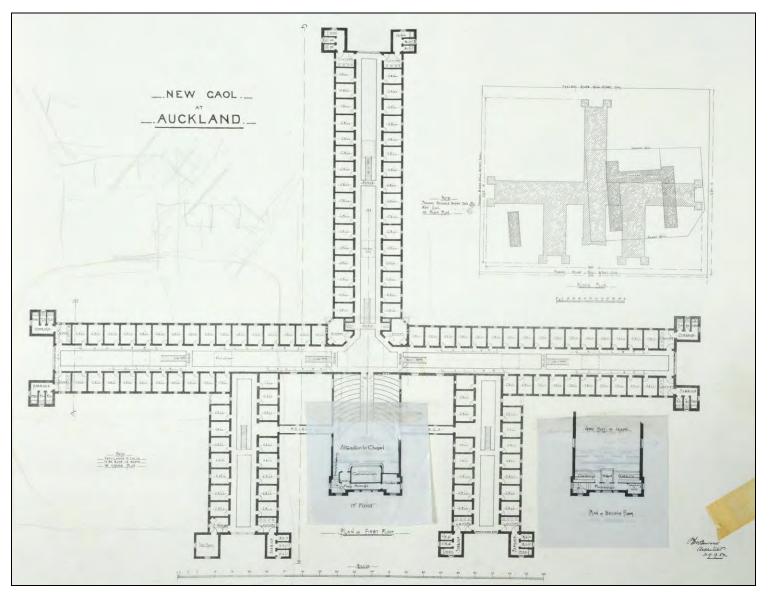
Plan of first and second floors of the Burrows' Prison (PWD 13824 Archives NZ)
